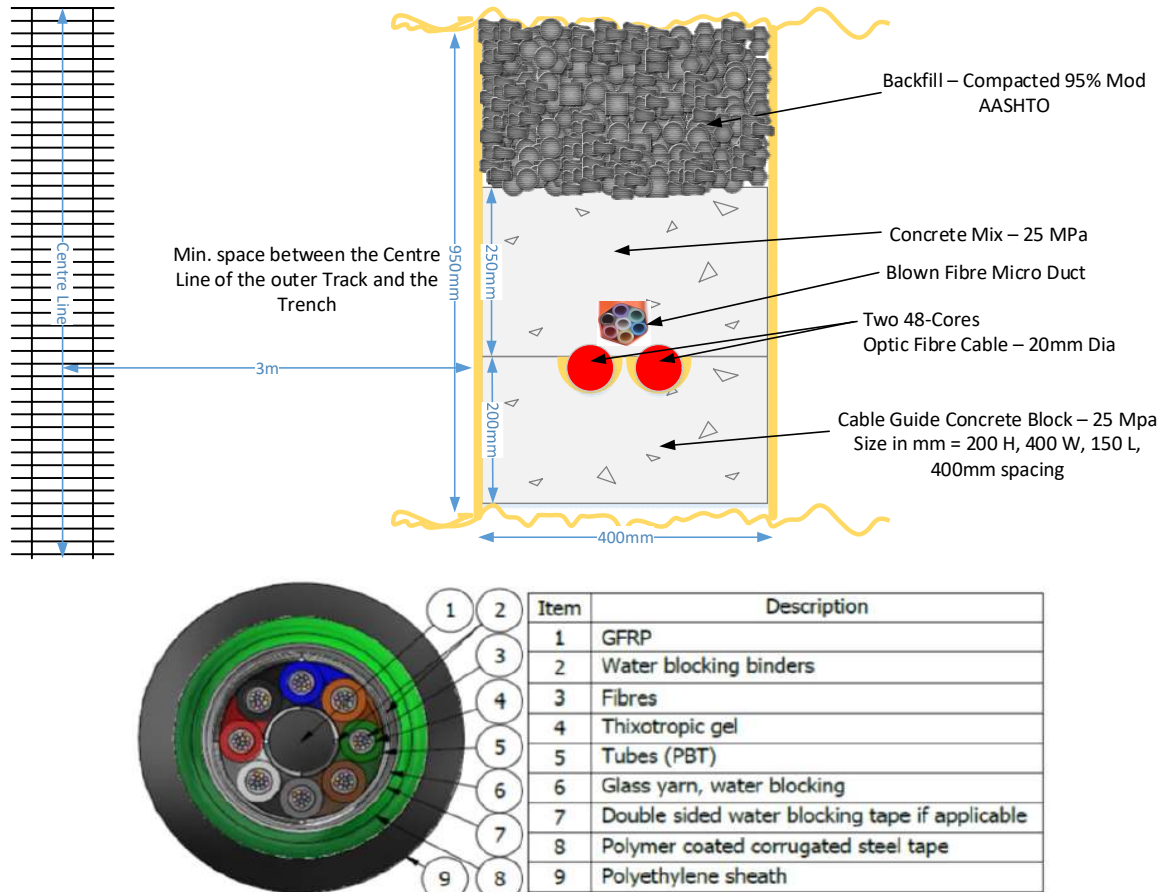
Underground Optic Fibre Cable Trench Layout
